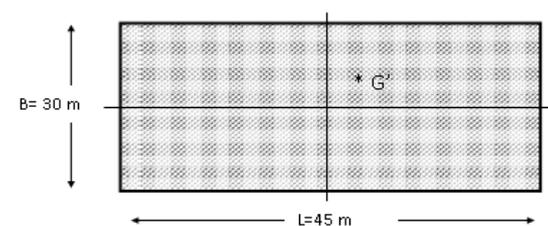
Geometry of rafted foundation (G' barycentre of applied loading)
